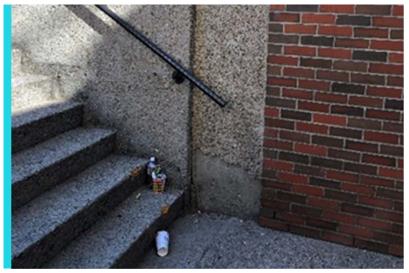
Exterior Cladding Damage at Wall Base Source: Dialog
